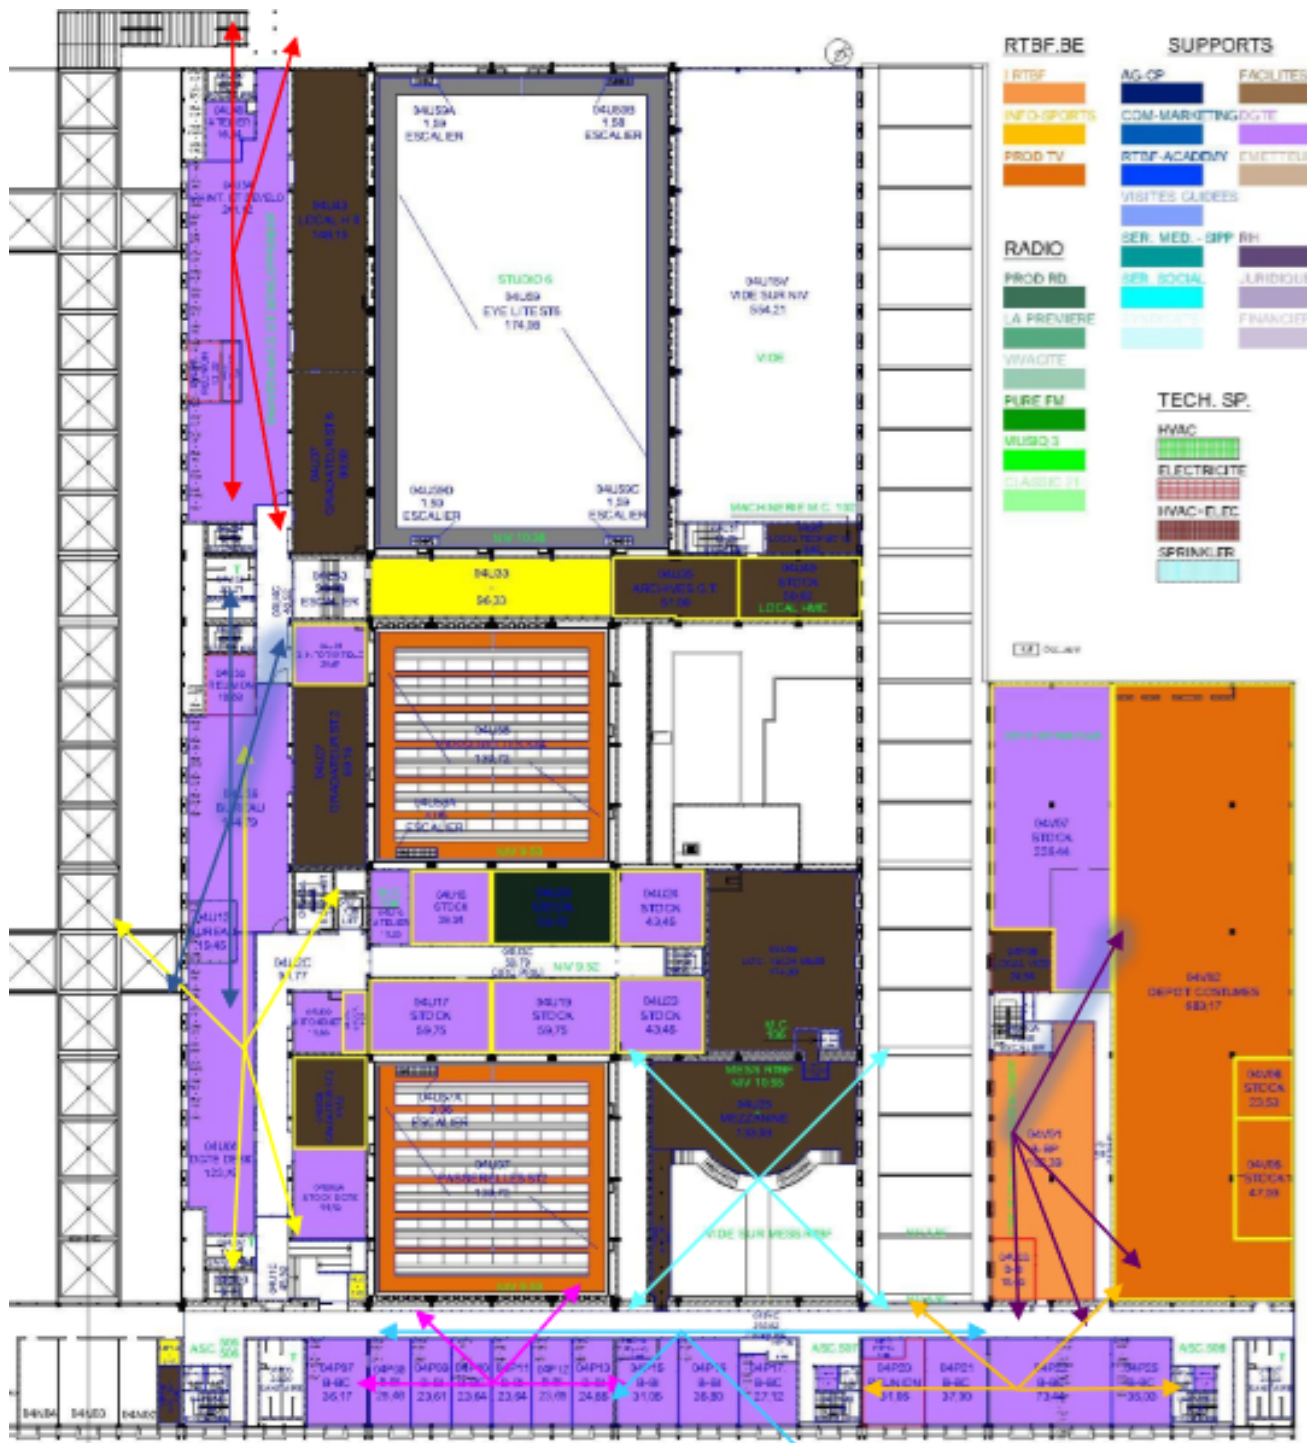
Design at 2.4 GHz for Floor 2 in Building CHJM
